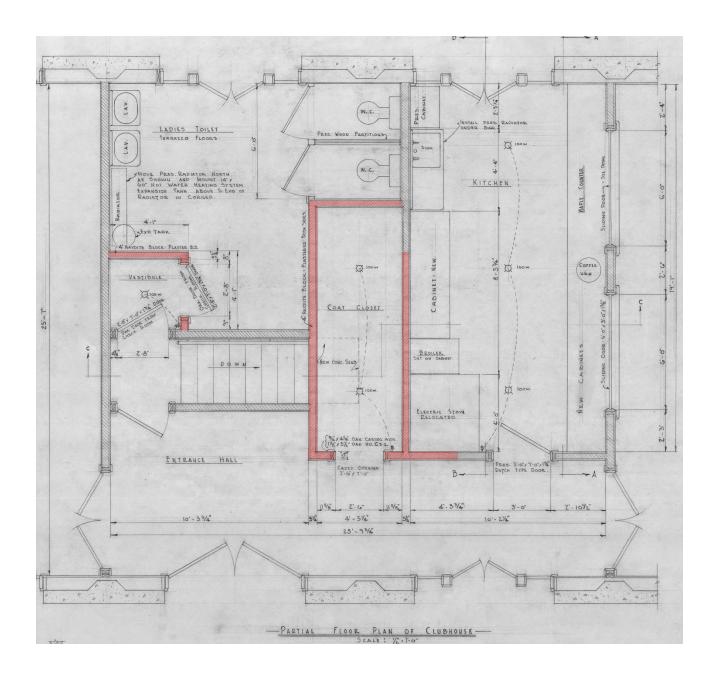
Detail of *Plan And Details of Kitchen, Coat Closet, And Ladies Toilet; Entertainment Floor of Pumping Station* which illustrate new walls constructed in late 1944 and/or early 1945 (AES, Drawing No. 5352; 25 October 1944). Note the patch in the concrete floor (represented by the dashed line in the "Coat Closet," which indicates the closure of a portion of the original stair opening. New walls constructed at this time are marked in red.
